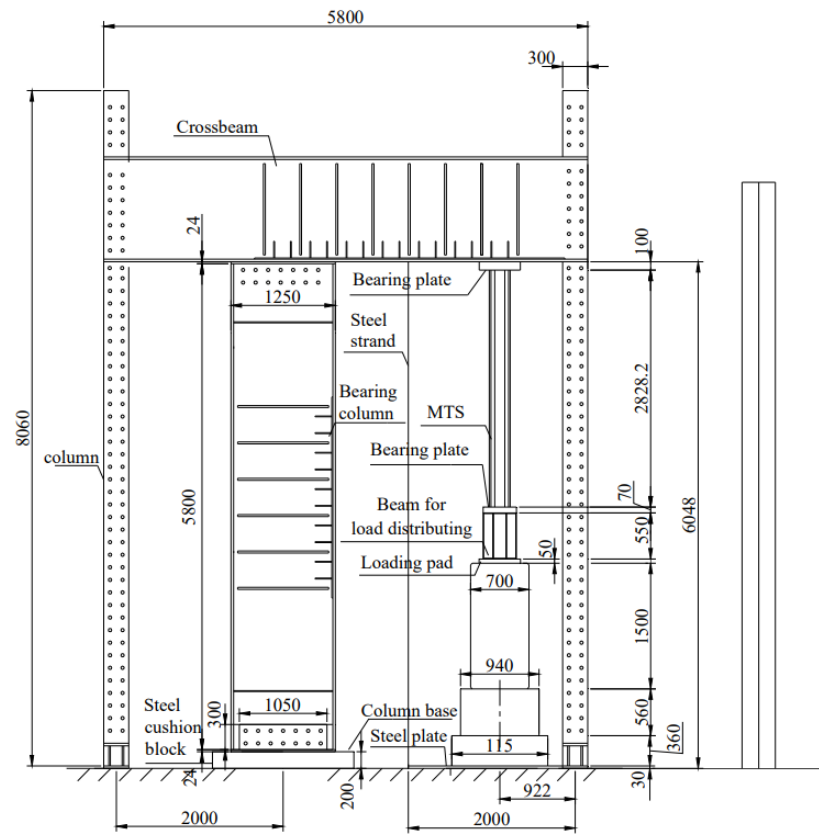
Elevation schematic view of the test setup (unit: mm) [22]
